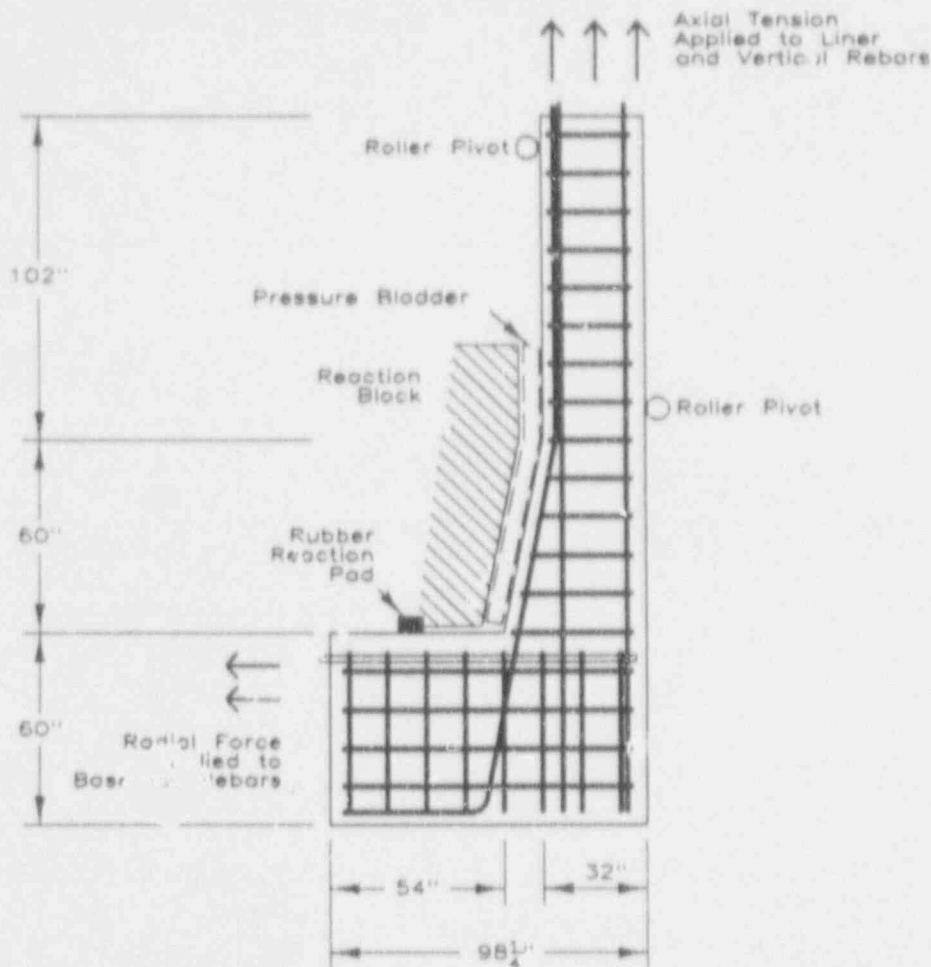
Specimen Tested by Construction Technology Laboratories
